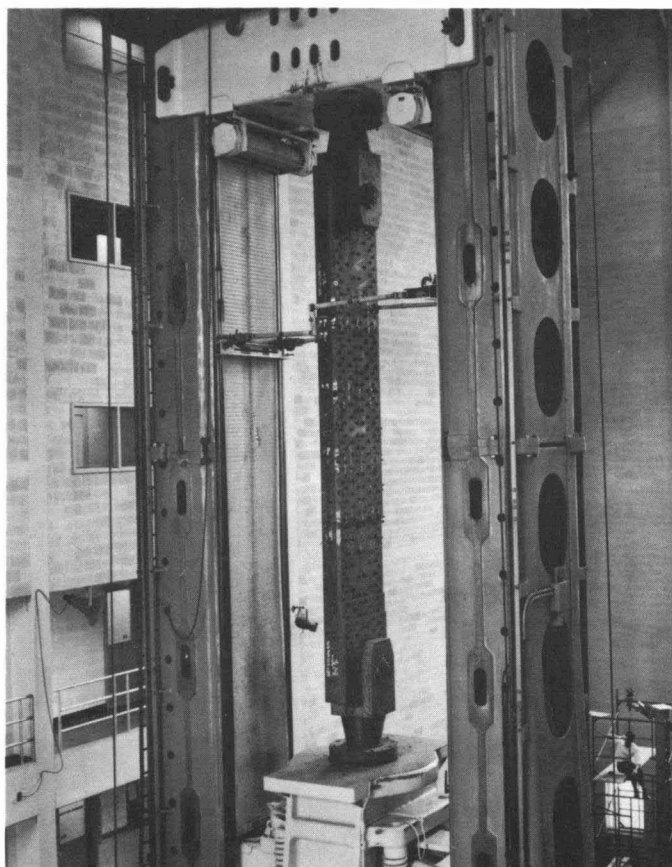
Simulated Joint in a 5,000,000 lb. Machine
